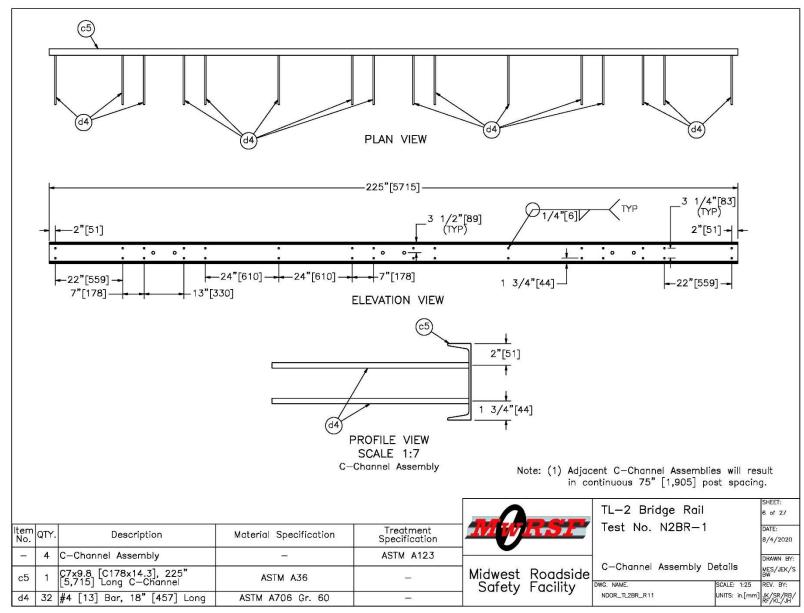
C-Channel Assembly Details, Test No. N2BR-1
